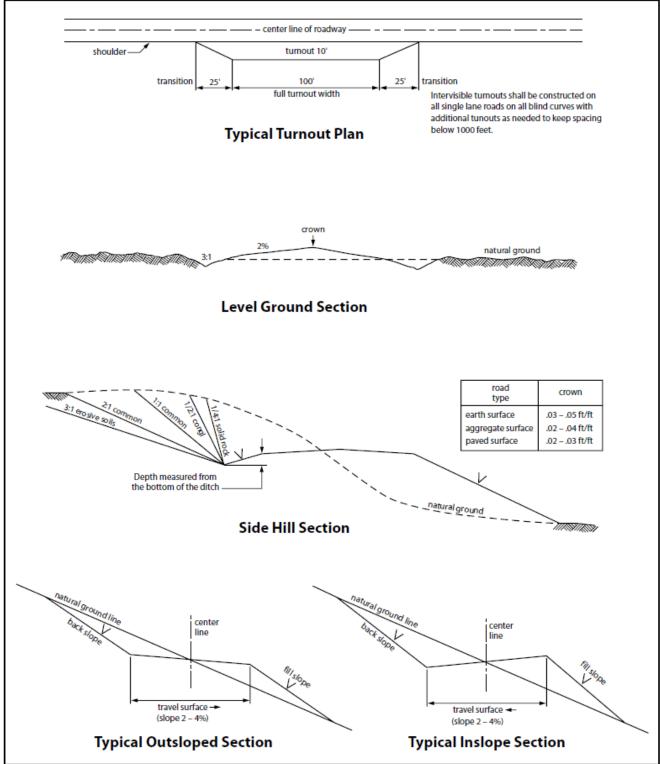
Cross-sections and plans for typical road sections representative of BLM resource or FS local and higher-class roads.
